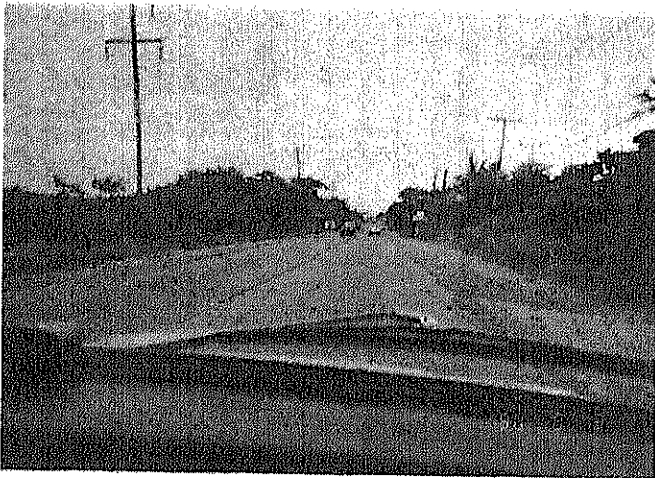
Stepped part at center of surface from Bauang - S. Fernando
